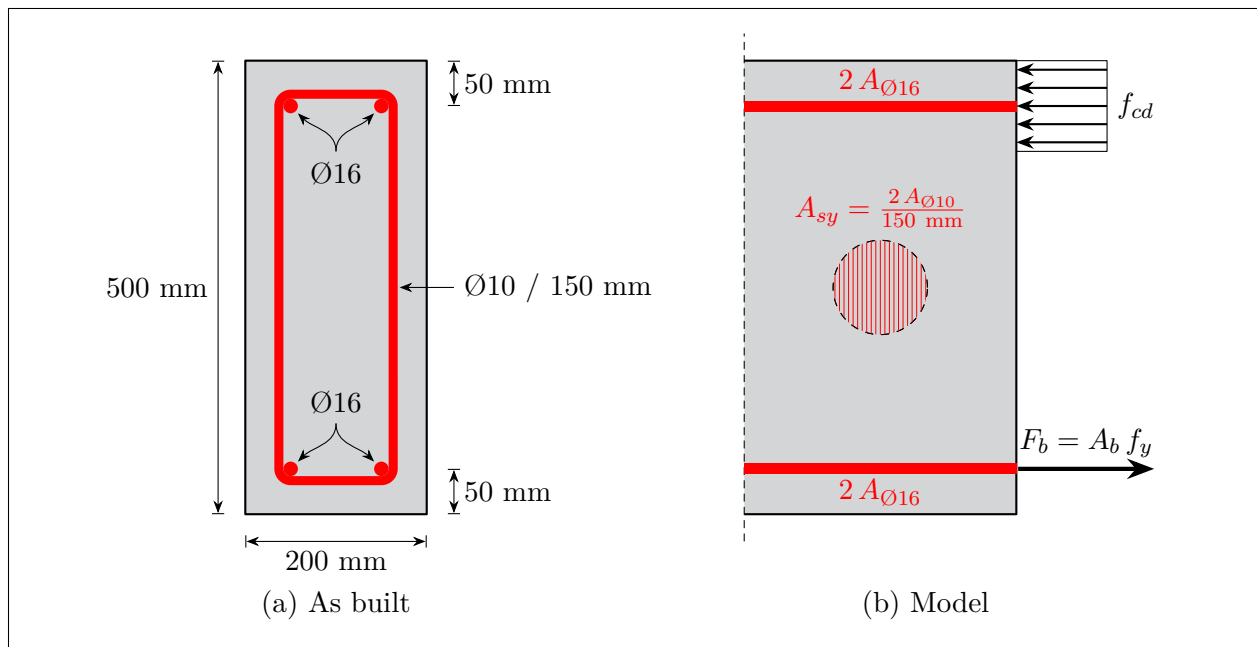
Cross section of the beam (a), reinforcement in model and plastic stress distribution (b).
